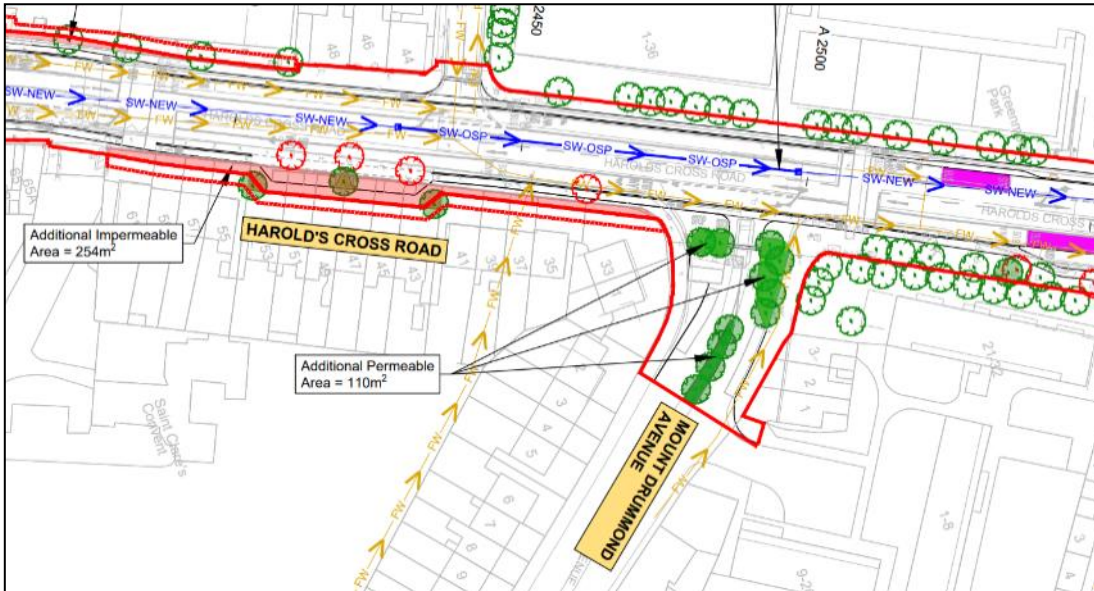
Proposed Scheme Drainage on Harold's Cross Road at Junction with Mount Drummond Avenue
